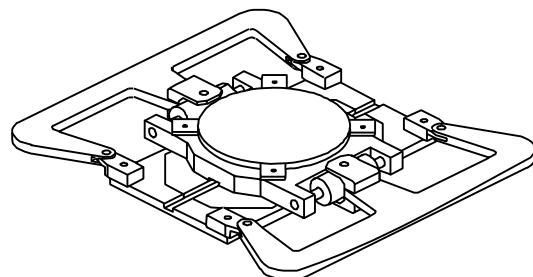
Sliding guided pot bearing combined with E-shaped hysteretic elements and Shock Transmission Units
